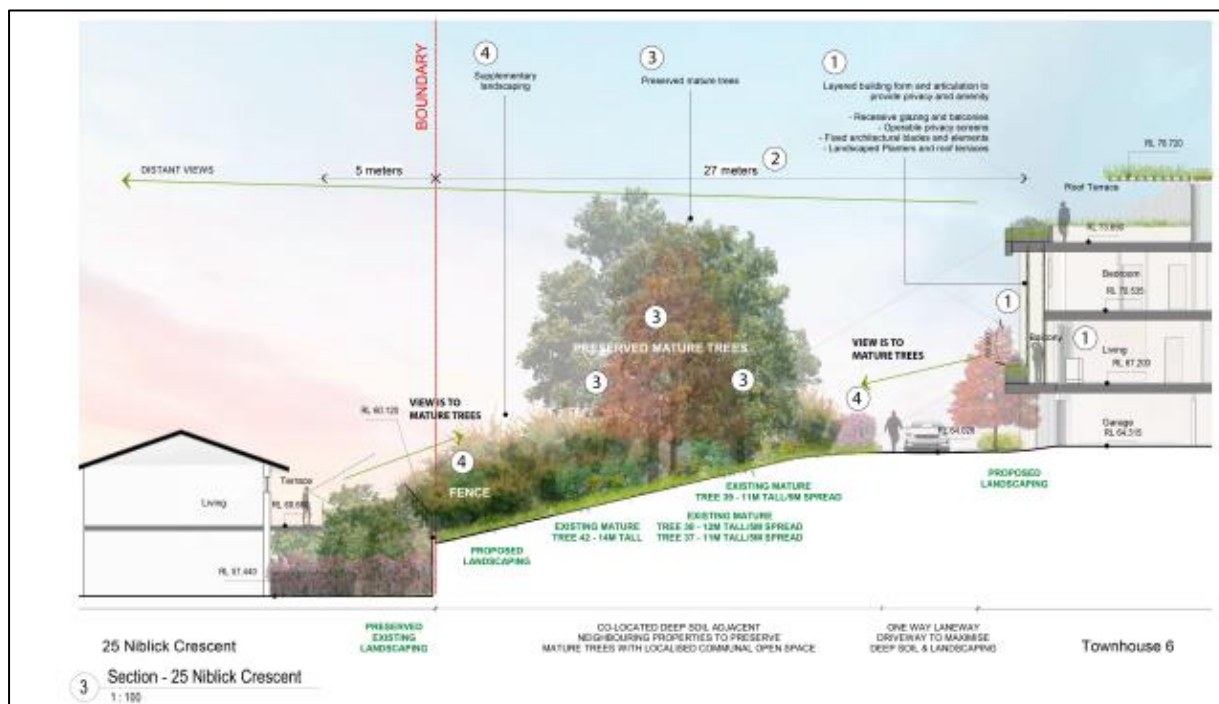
Section Landscape Plans, Sturt Noble and Ass 2023
